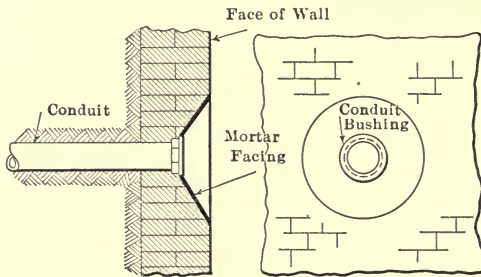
WALL FACE AT IRON CONDUIT ENTRANCE.
